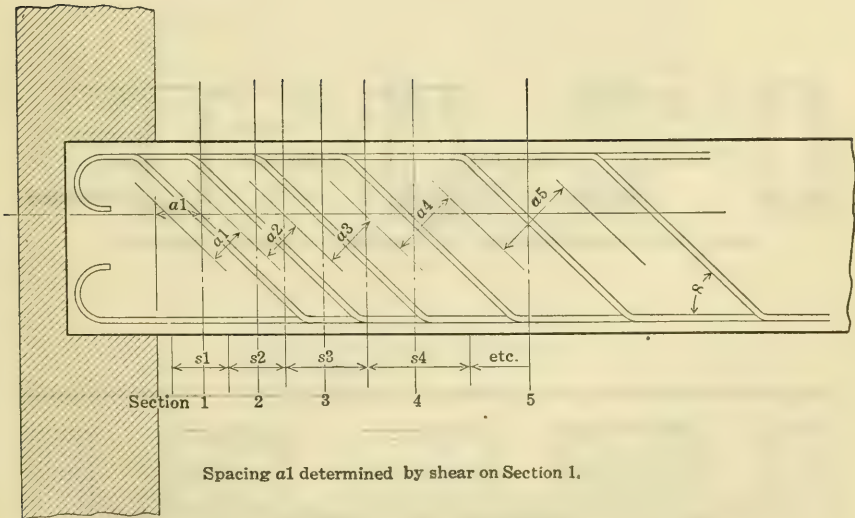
TYPICAL BEAM WITH WEB REINFORCED BY MEANS OF SERIES OF INCLINED BARS.
